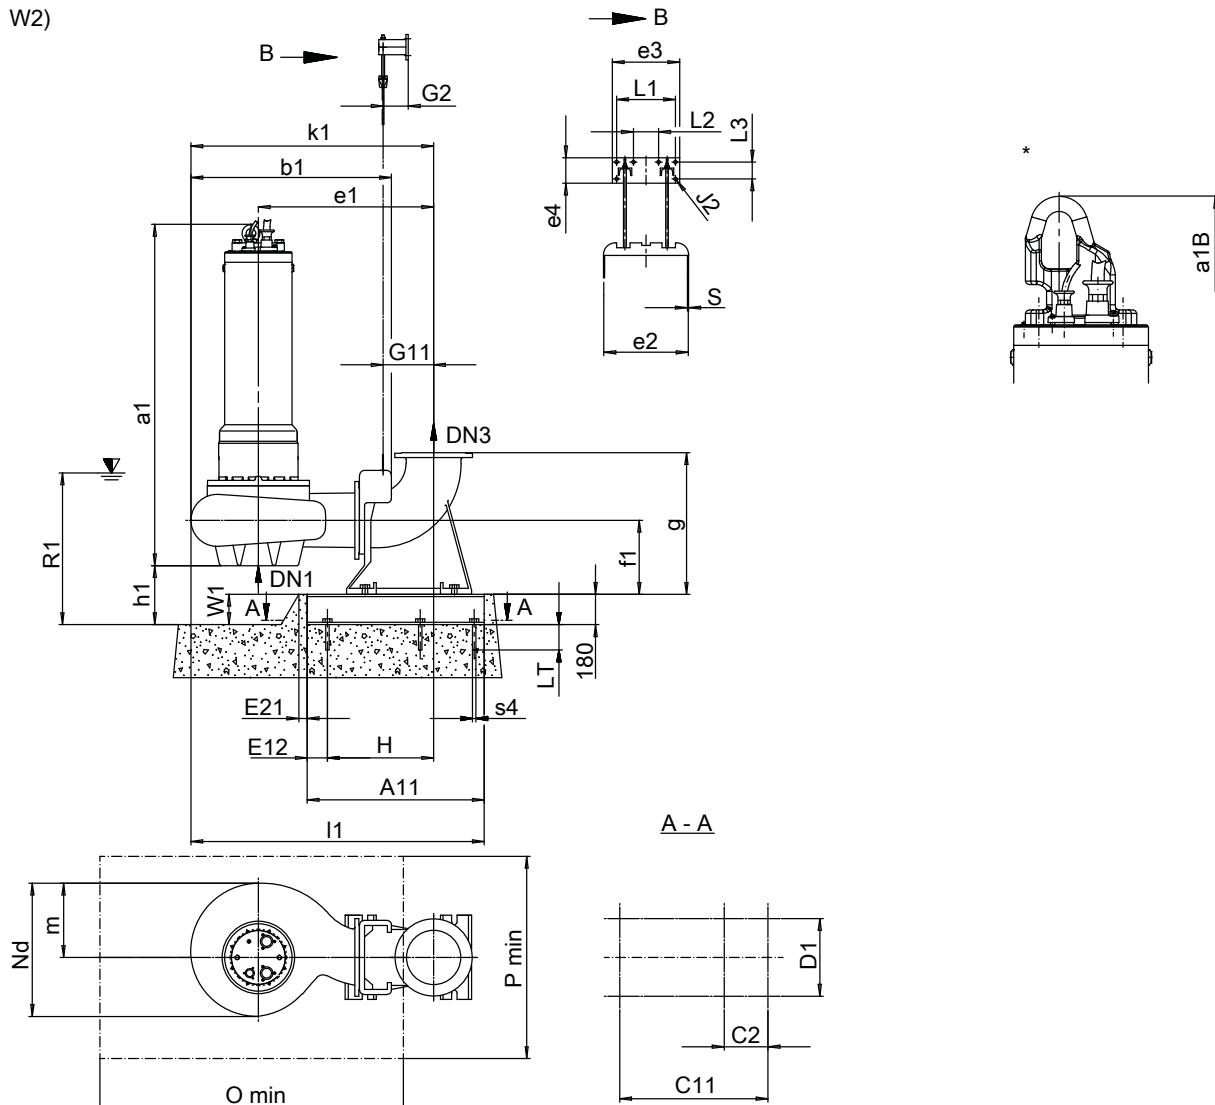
General arrangement drawing W2, stationary on duckfoot bend, guide wire arrangement, foundation with step, with foundation rail, large upper holder, motor version N
